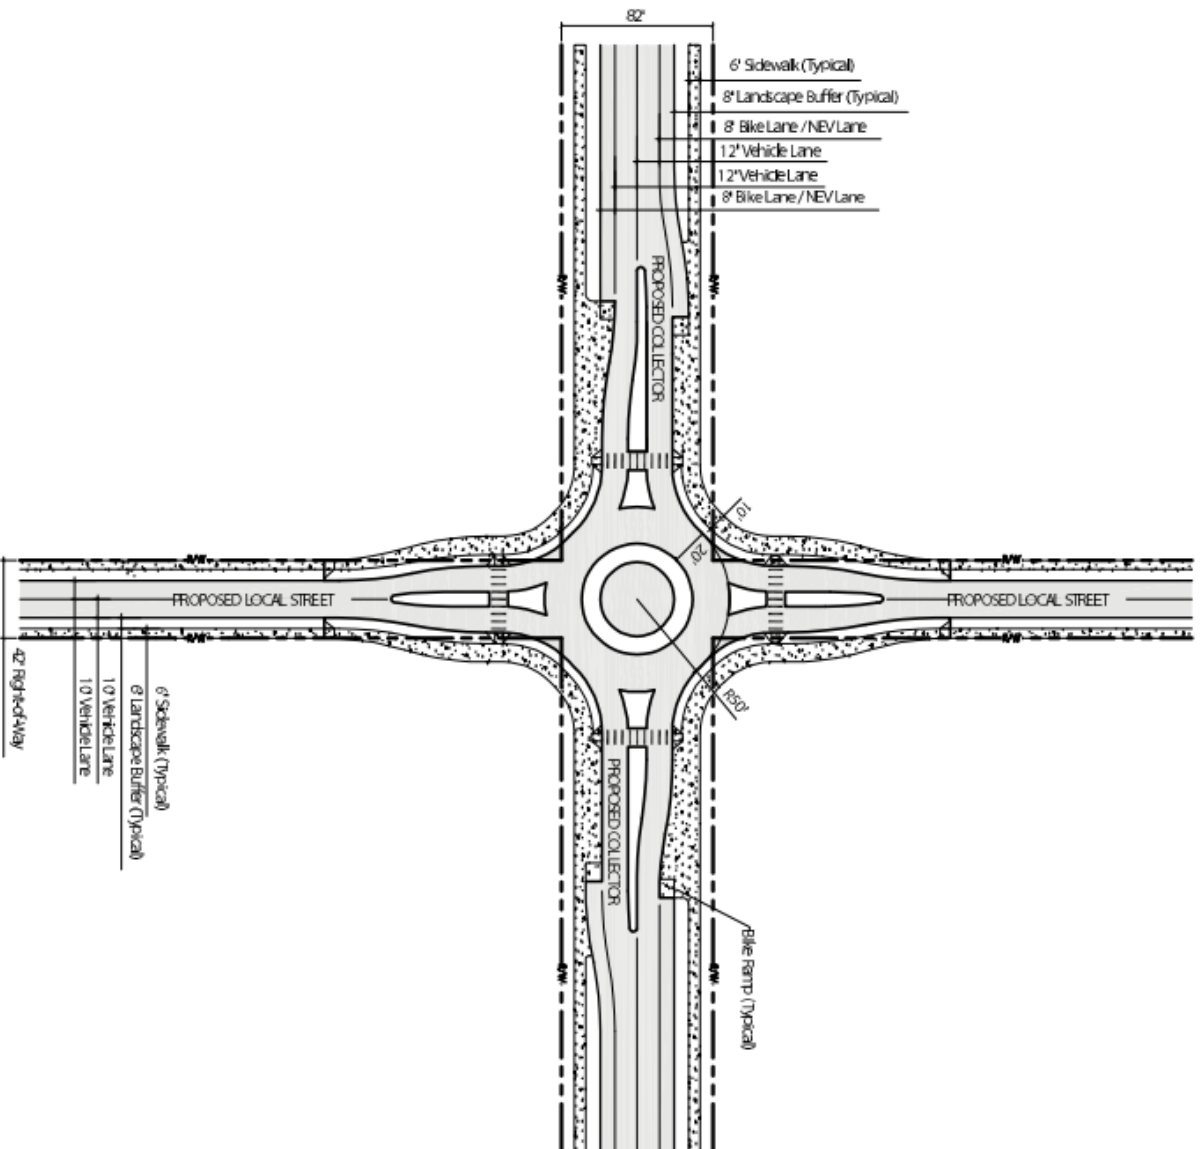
TYPICAL ROUNDABOUT – COLLECTOR TO LOCAL ROAD
